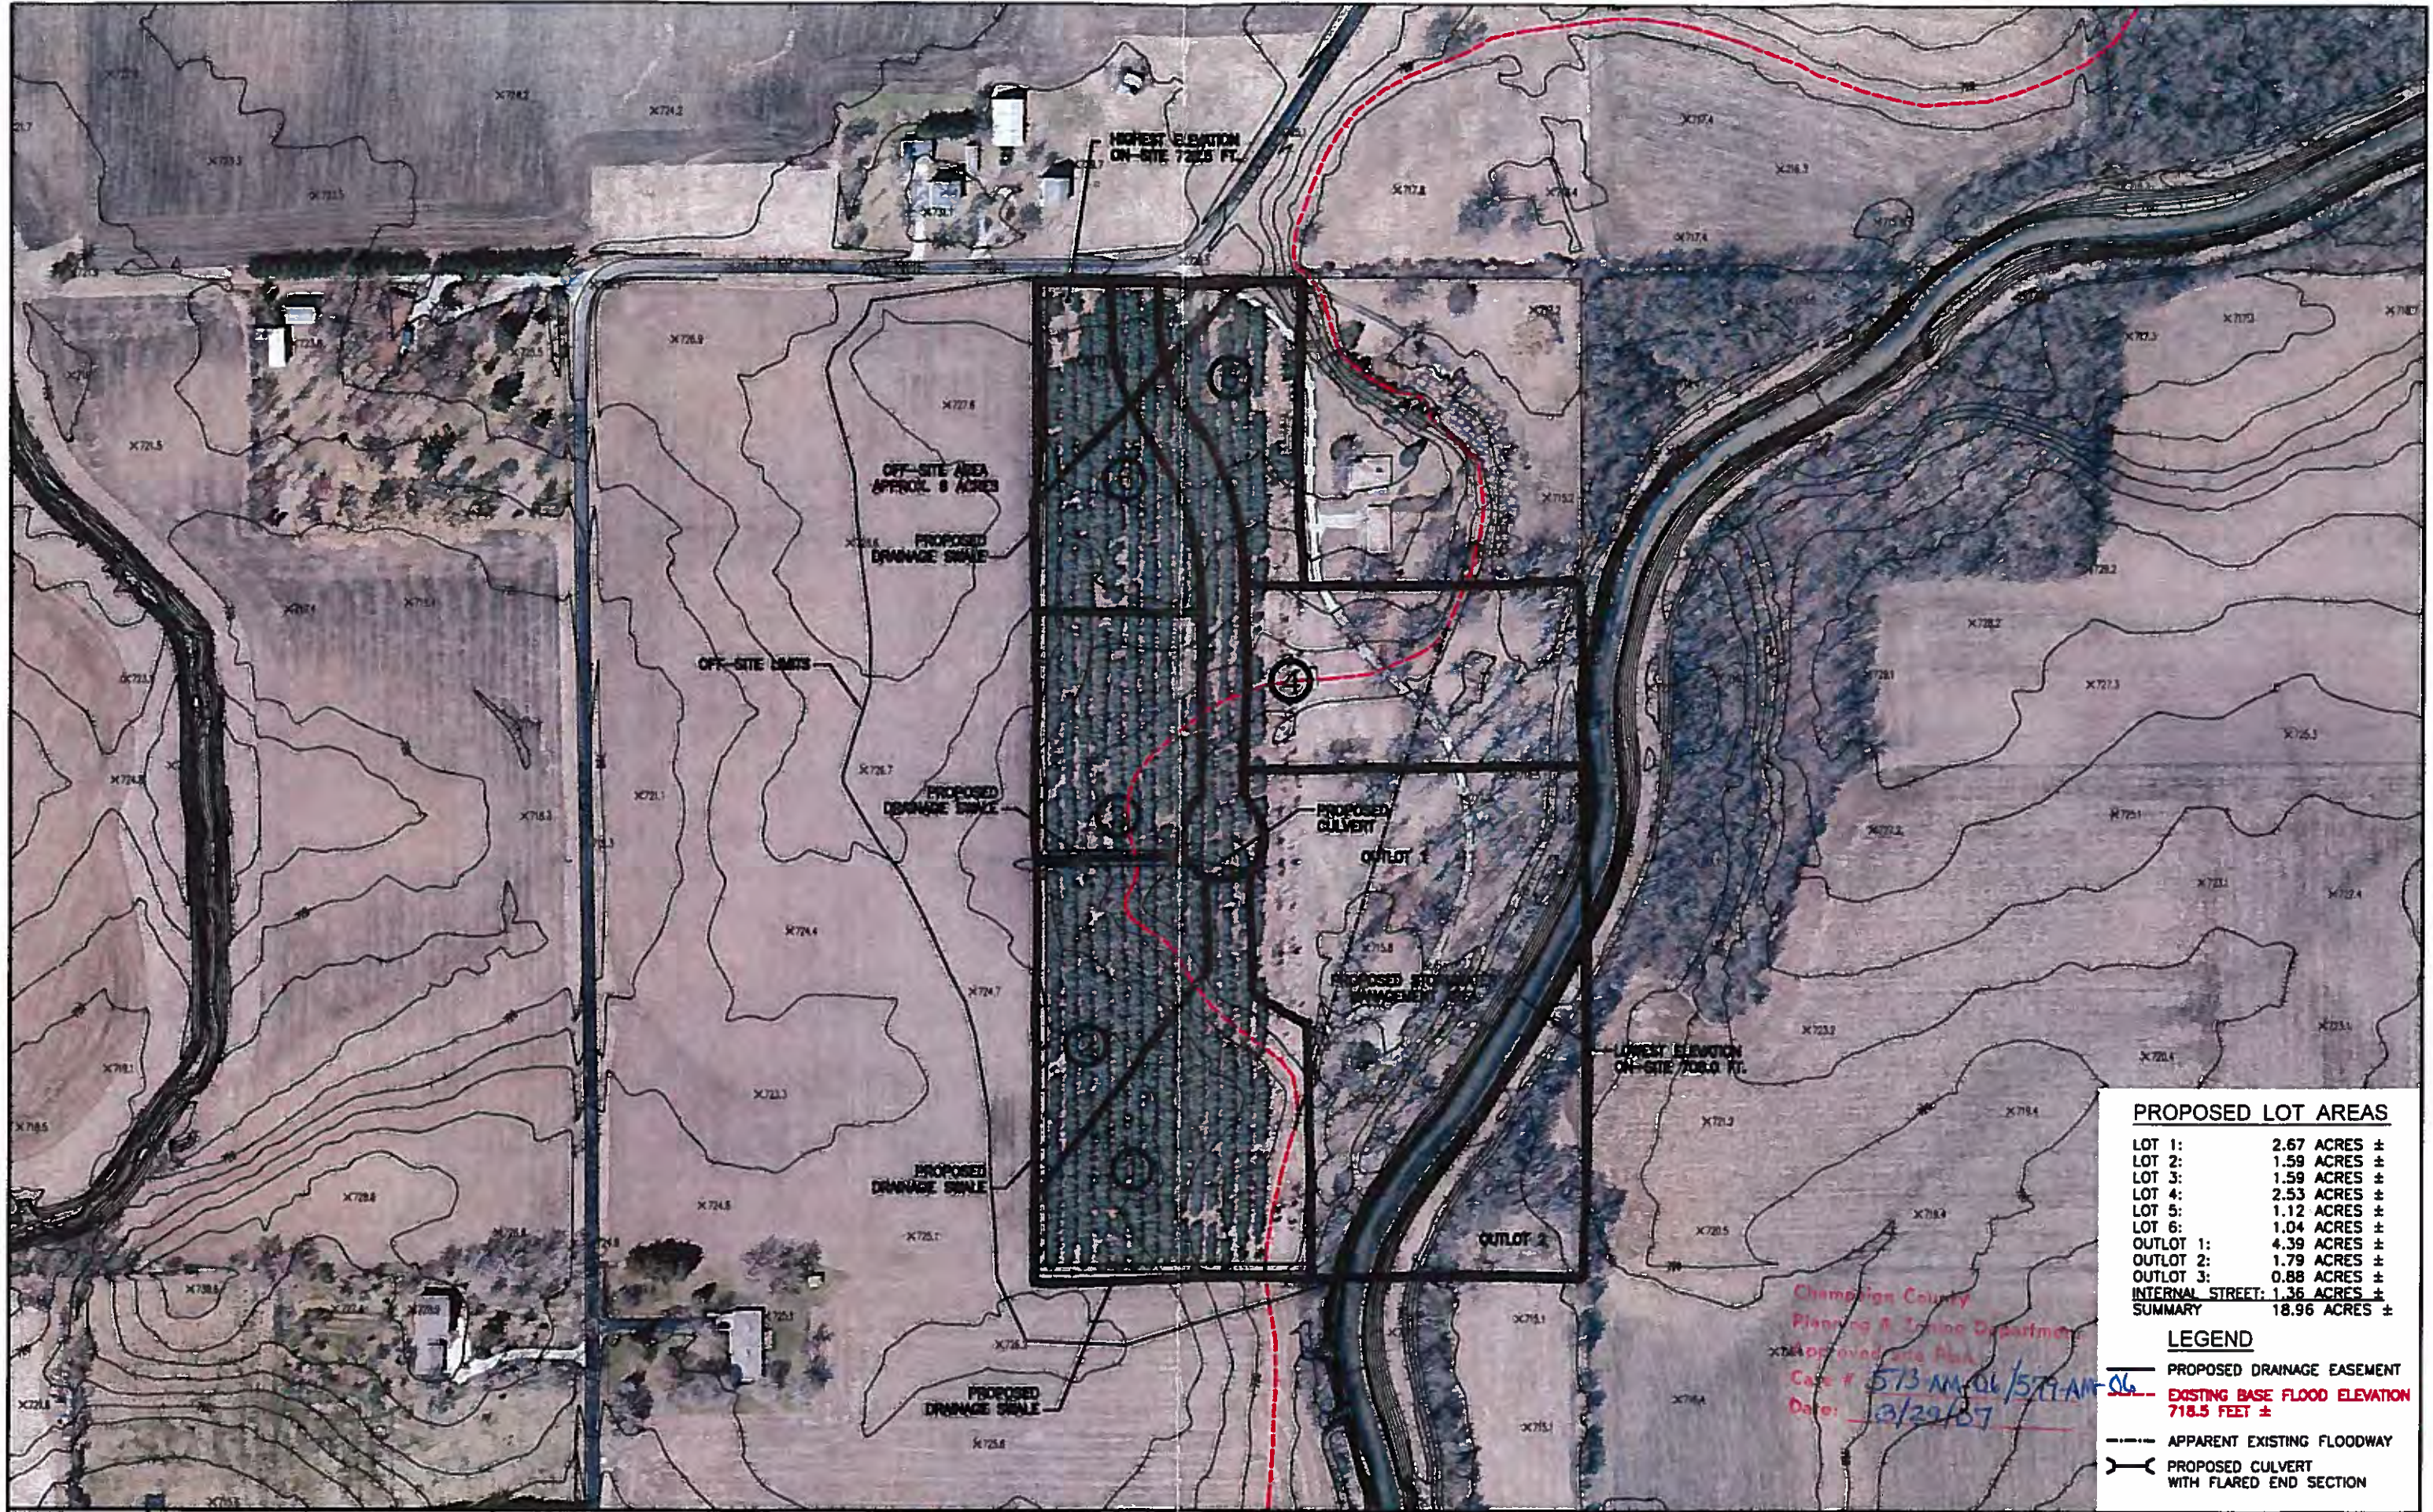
Approved Site Plan (CCDPZ)
